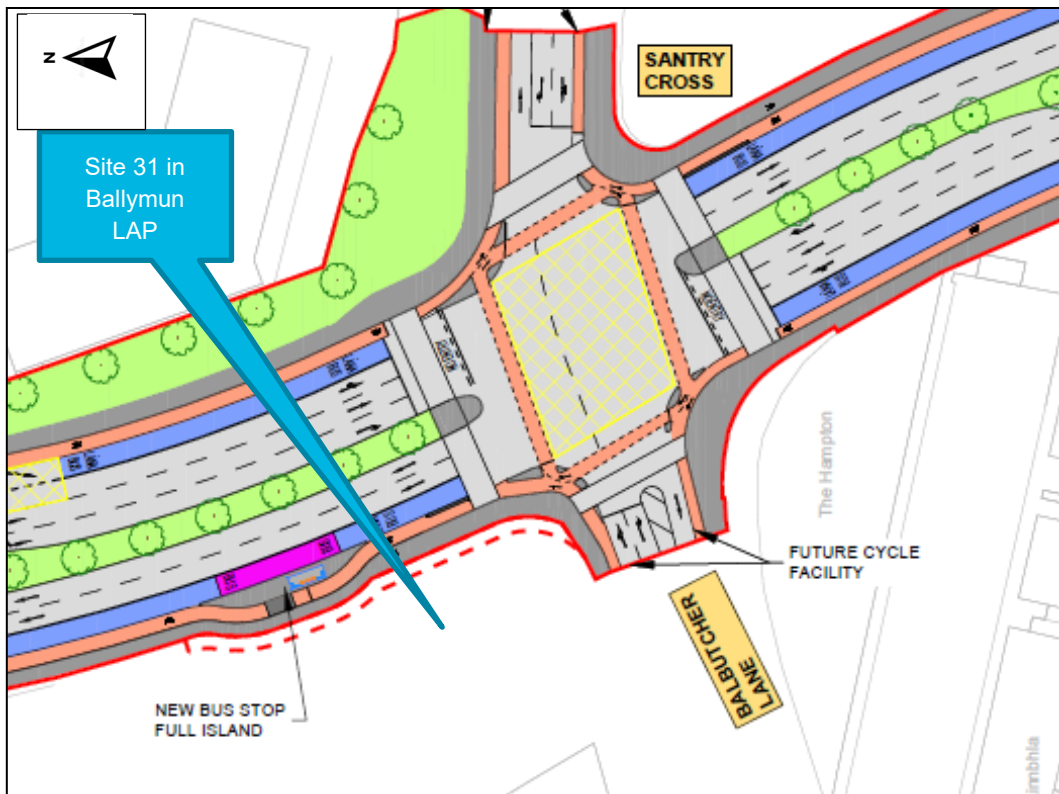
Extract from General Arrangement Drawing Sheet 2 at Site 31 on Ballymun Road
